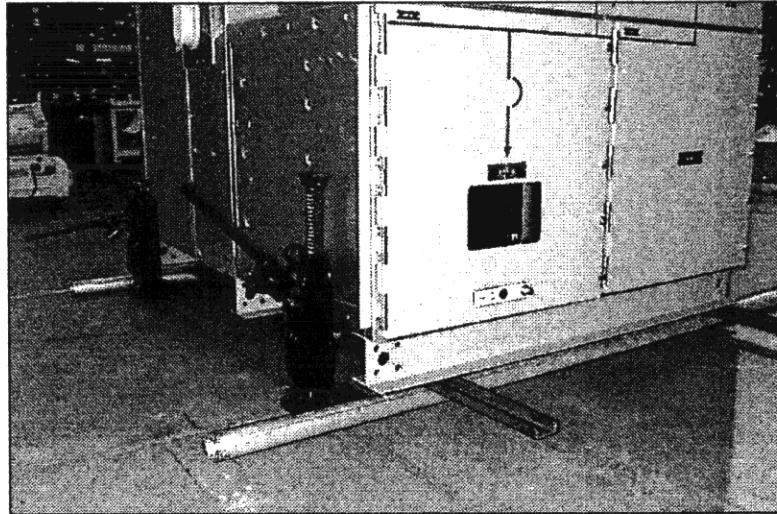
Placement of rollers and channels for moving SafeGear perpendicular to the shipping bases.
